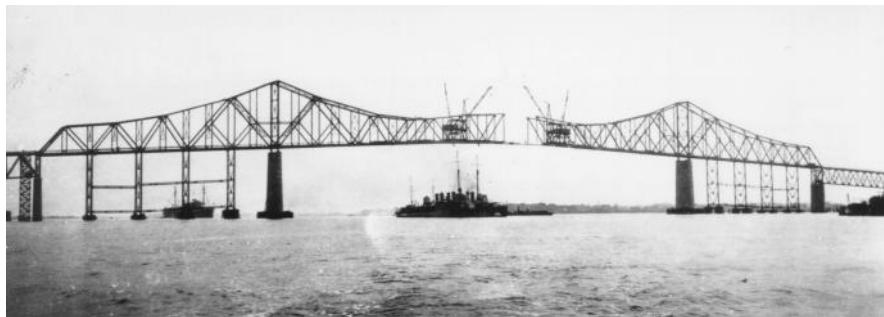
First Cooper River cantilever bridge, Charleston, S.C., 1929. Erection travelers constructed 450 ft. (137 m) side spans on falsework, then went on to erect 1050 ft. (320 m) main span (including 437.5 ft. [133 m] suspended span) by cantilevering to midspan.
